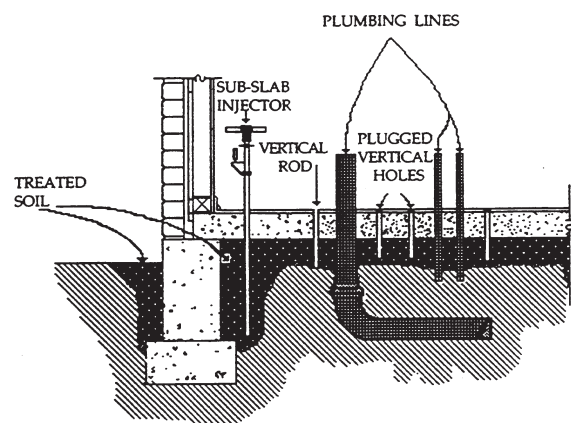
Treatment under concrete slab with vertical rodding at joints, cracks, and openings around plumbing.
